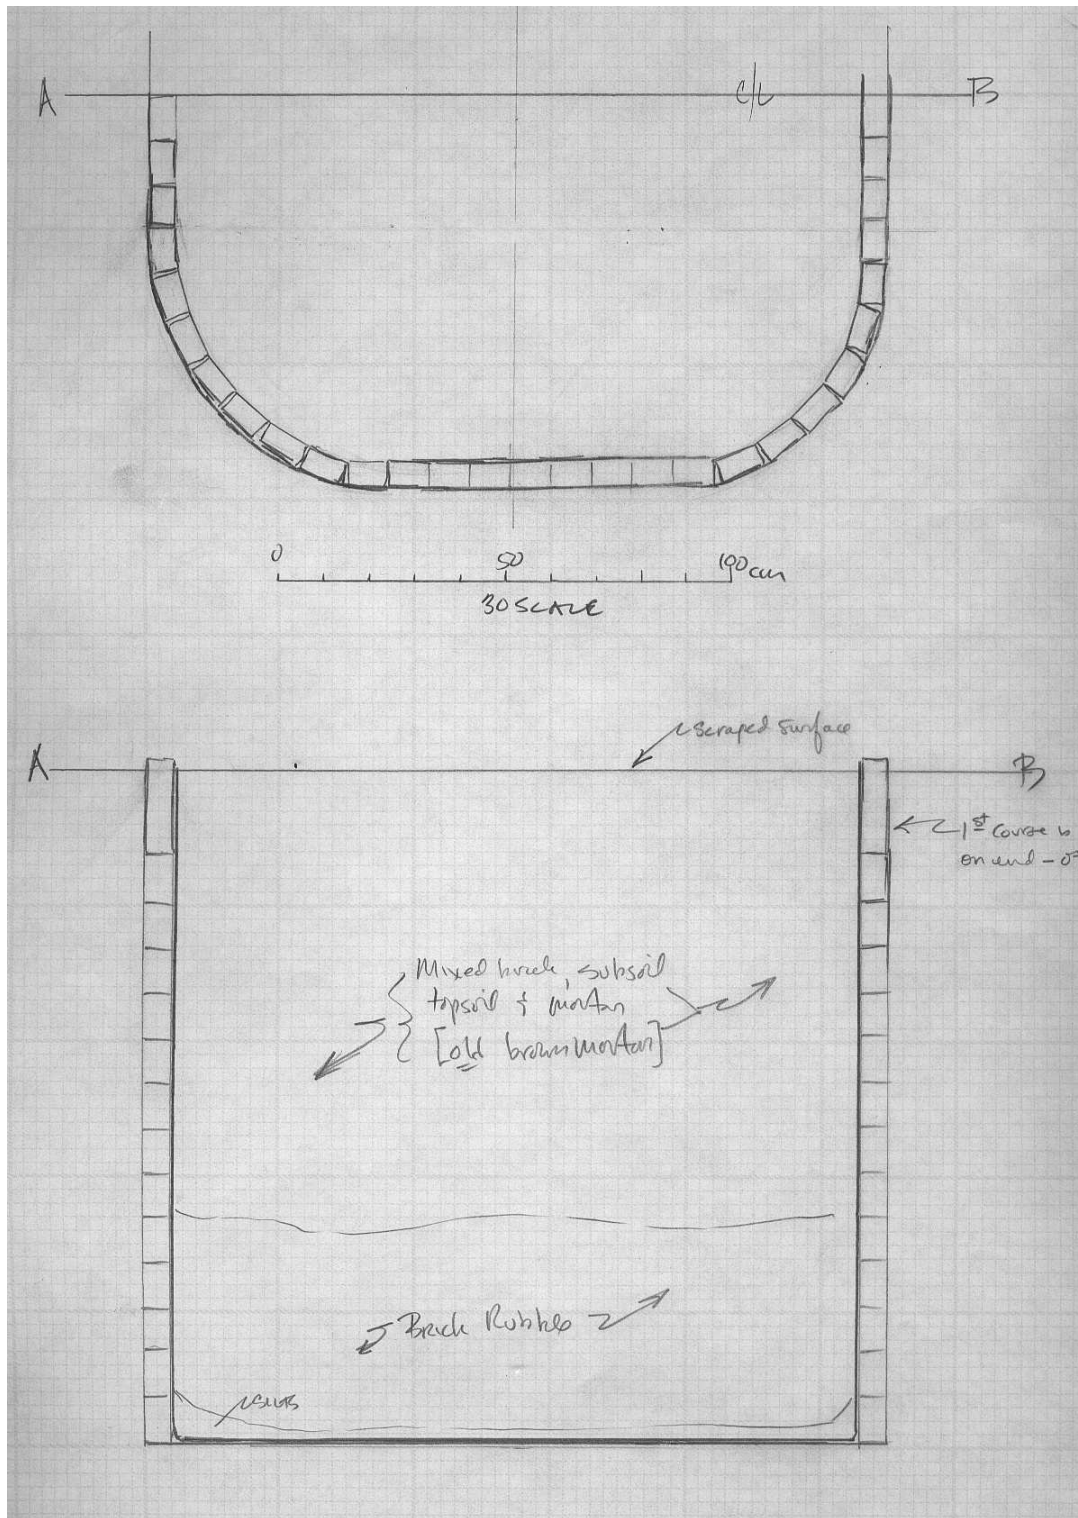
Although early brick cisterns generally were round in plan, oval examples were also constructed. This example (Feature 78), which was documented during excavations at the Lincoln Presidential Library and Museum parking garage project (Block 2, Ninian Edwards Addition, Springfield) was constructed with a flat base (lacking brick) and side walls with brick laid in both sailor and soldier coursing (Mansberger 2003). No evidence for a brick dome was present. This brick-walled cistern probably dates from the 1840s or early 1850s.
